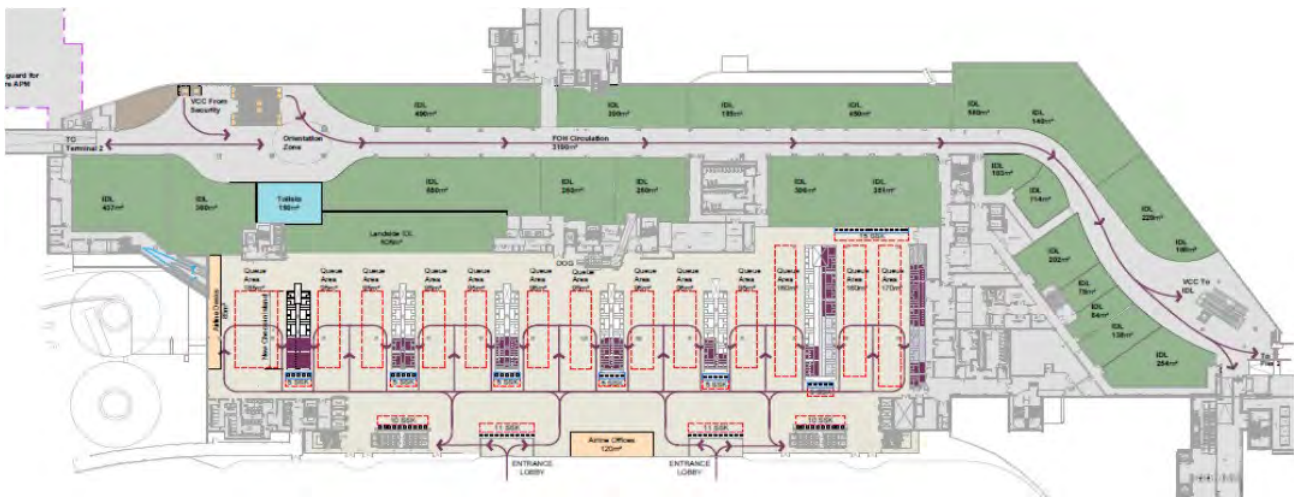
Proposed new layout of expanded IDL at Terminal 1
